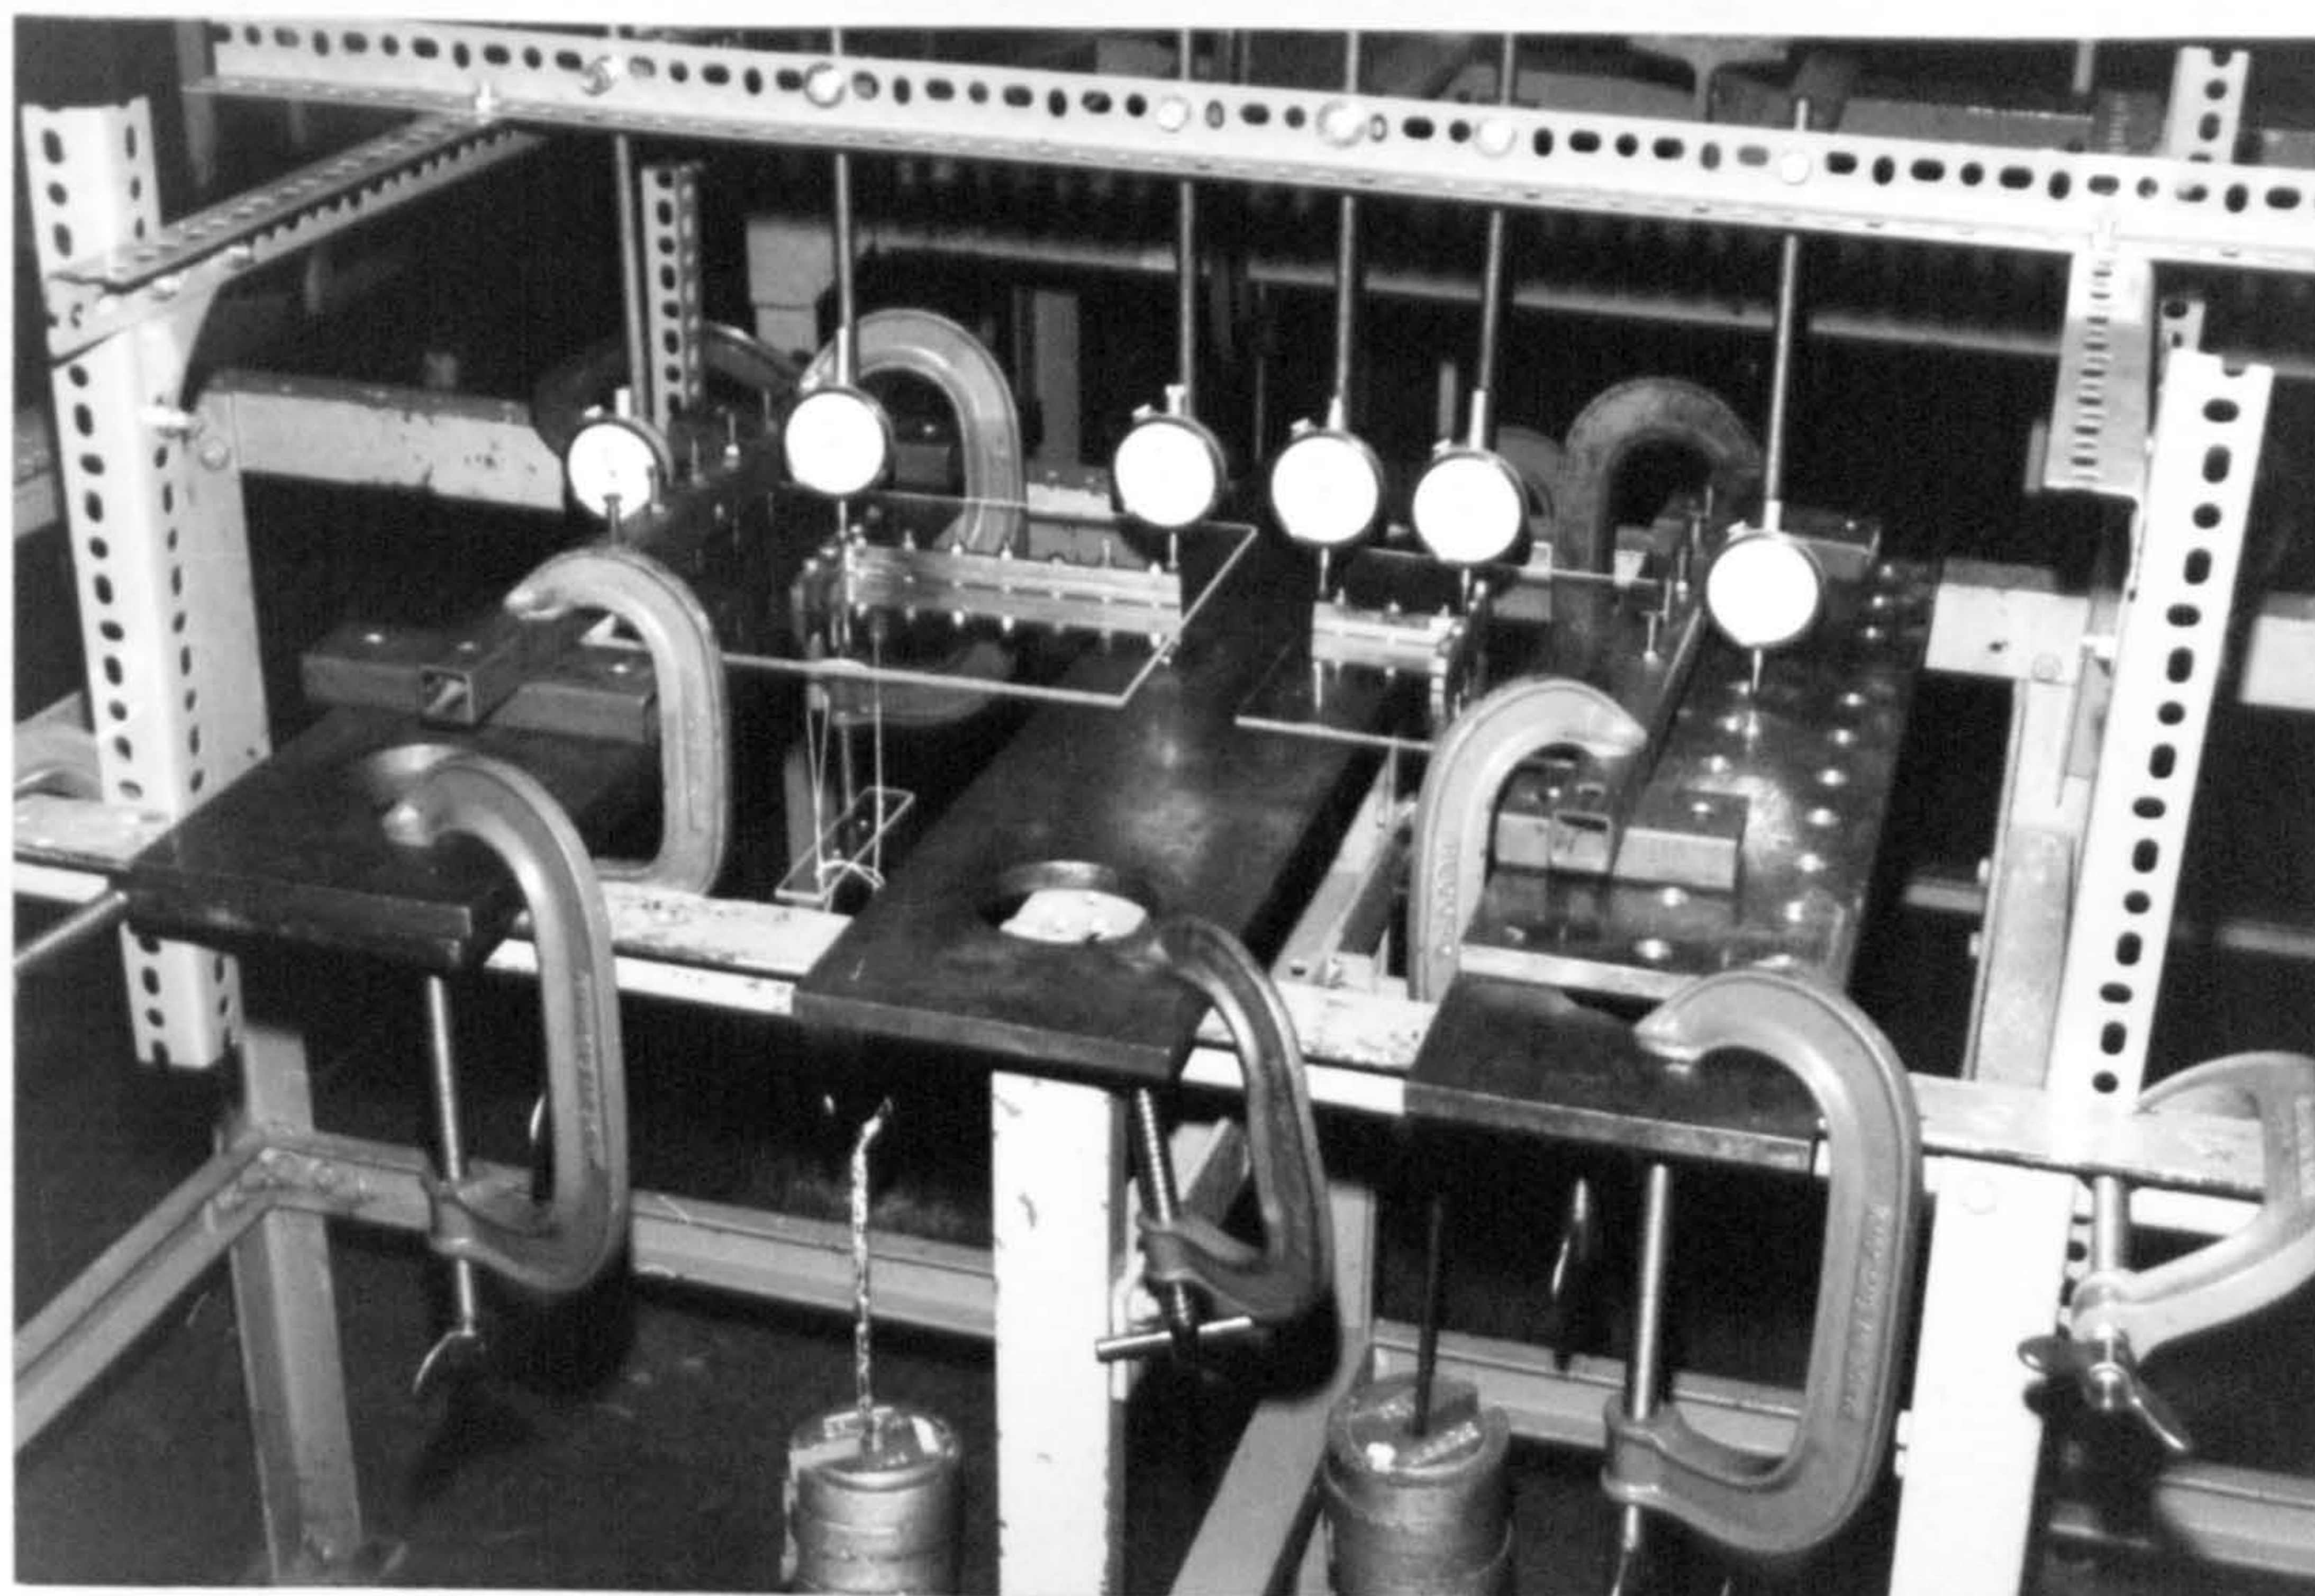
(a) Pair of Flanged Wall-Slab Models Under Test
